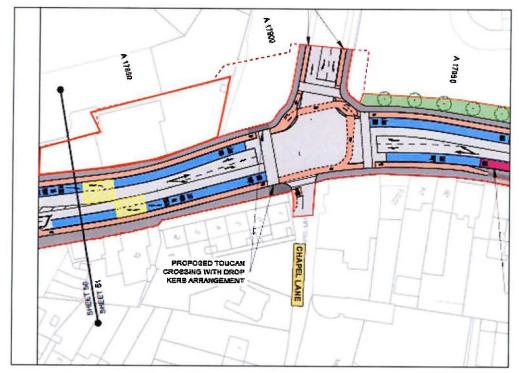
Scheme Plan for Bray, subject site generally outlined in red - East Side - (Source: Jacobs, 2023)
